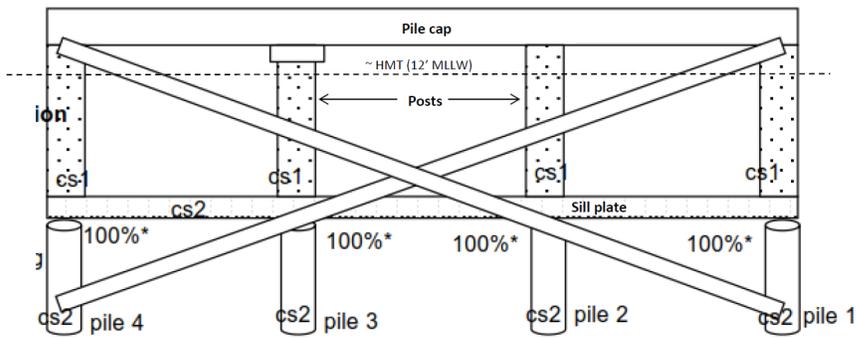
Cross section drawing showing cap, post, plate, cross member and piles.
